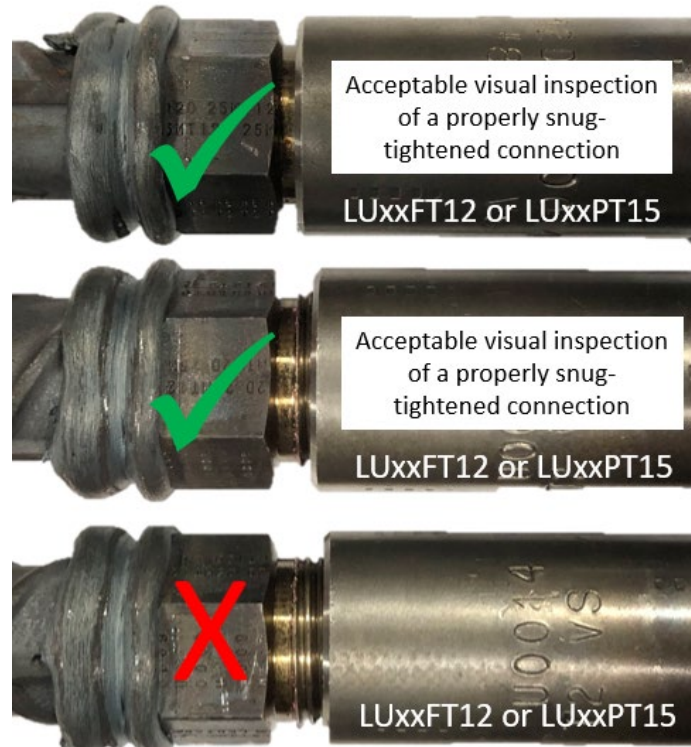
, TOP & MIDDLE: Visual inspection is accepted (IF INSTALLED PER IP8396/IP8695) as less than one full turn of the male taper thread is visible at the mouth of the female taper-threaded component (LUxxFT12 or LUxxPT15). BOTTOM: Visual inspection is rejected as more than one full turn of the male taper thread is visible at the mouth of the female taper-threaded component.
